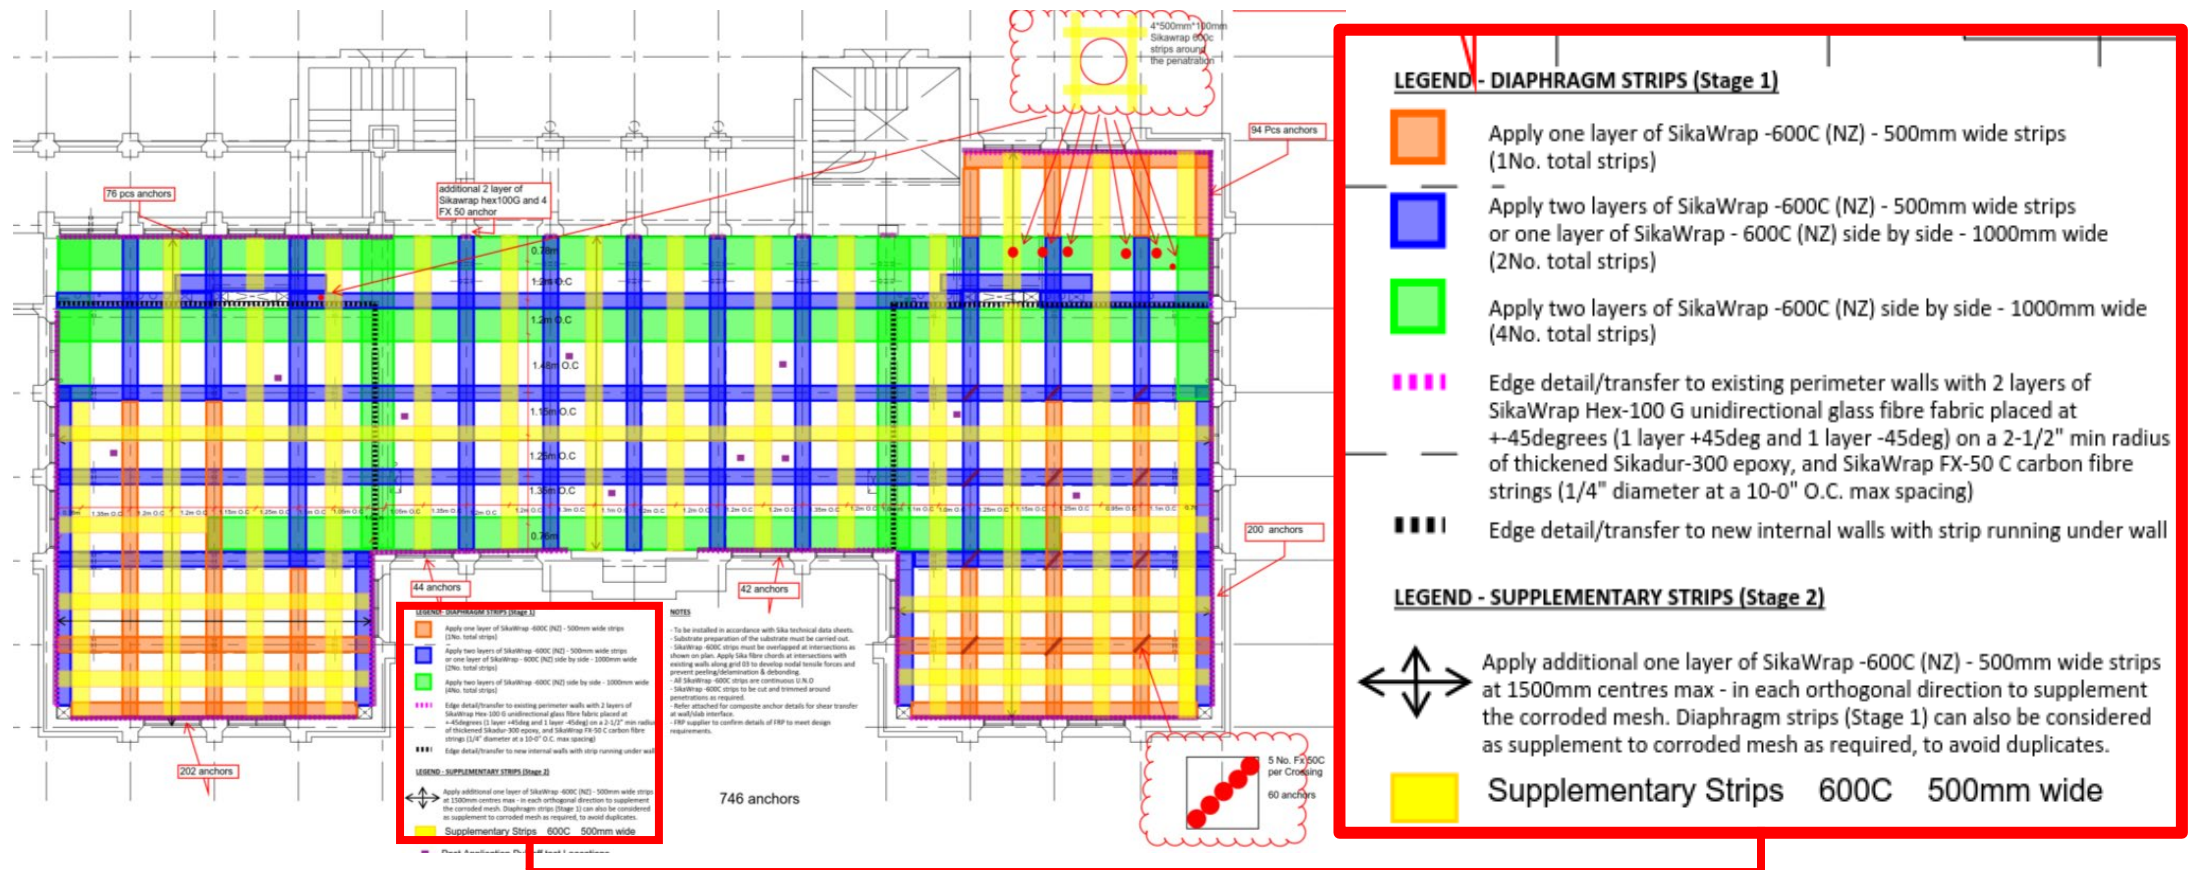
Floor plan and FRP configuration (del Rey Castillo et al., 2019-a)
